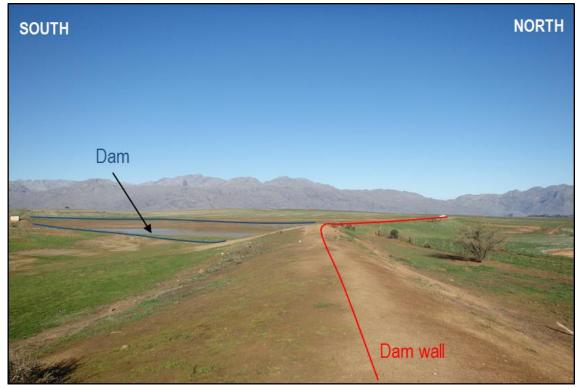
A photograph of the Driefontein Dam and associated dam wall.
